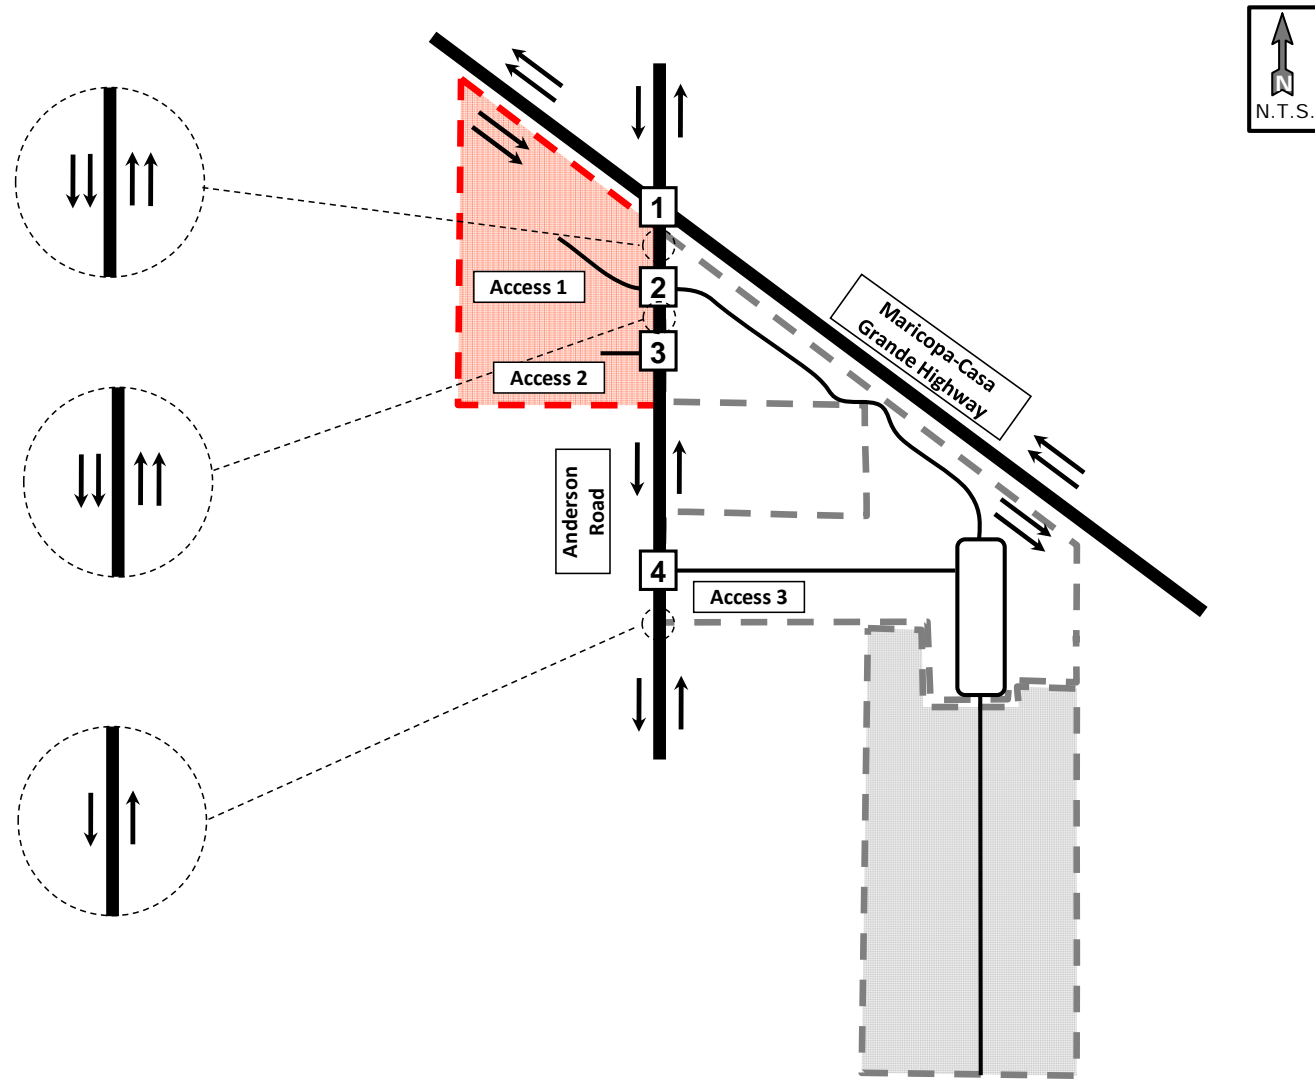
2020 with Site (Phase 1) Recommended Roadway Cross-sections
